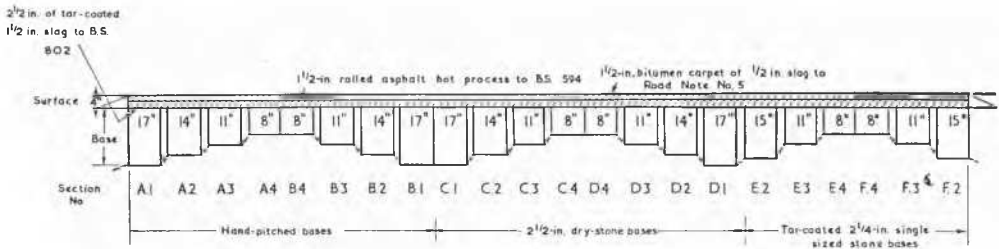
Layout of the experimental sections for pavement design experiment trunk road A1.
